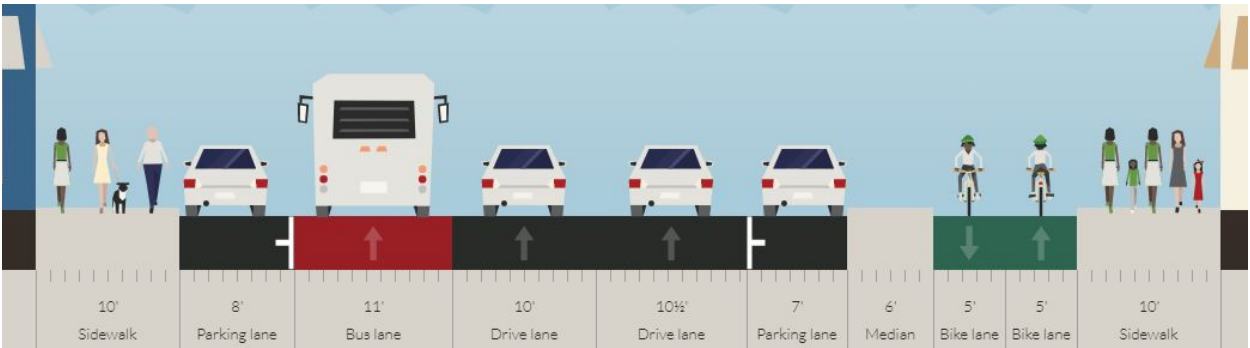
Typical Cross Section of Folsom Street between 5th and 4th streets and Mabini streets, looking east
